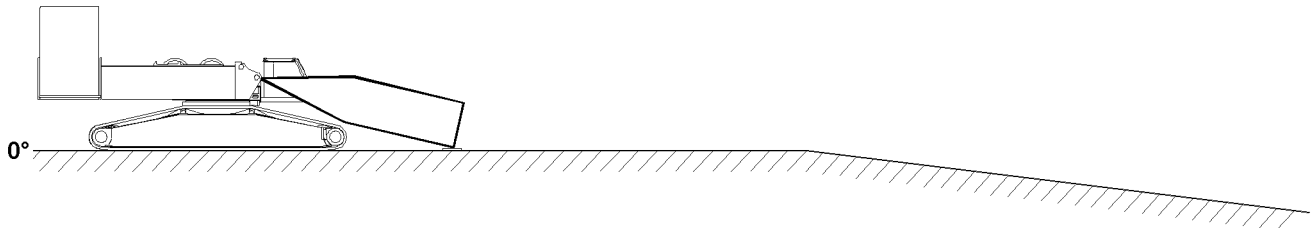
Disassemble and remove the boom - intermediate sections to the boom - pivot section
